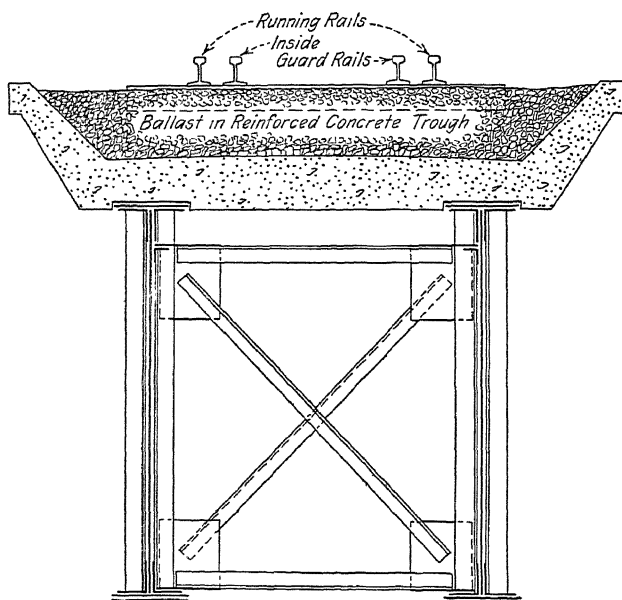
Cross-Section of Typical Railroad Girder-Bridge with Ballast Deck.
